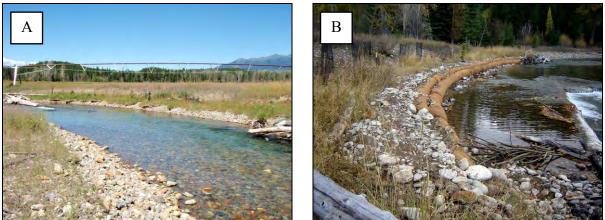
Photographs show Site 7 before (Photograph A) and after (Photograph B) construction of coir log fascine. Photograph A is taken from the left bank looking downstream. Photograph B is taken from the right bank looking upstream.
